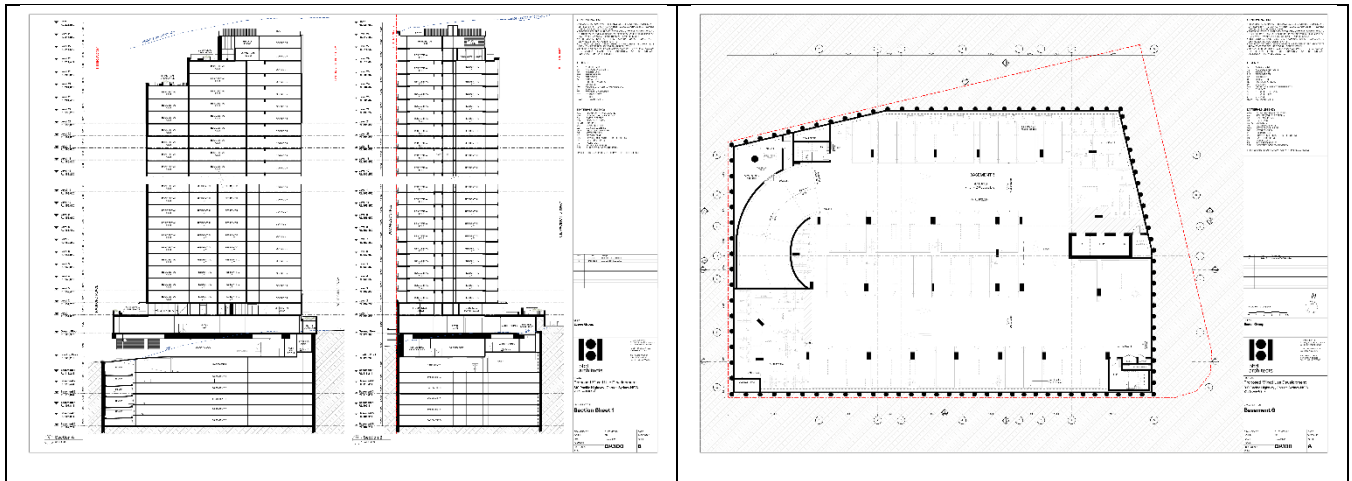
SSDA works - Excavation, shoring, and piling works beyond RL107.64m AHD and Redevelopment
